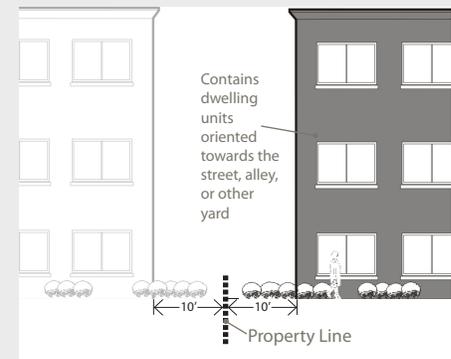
Ten foot side or rear yard setbacks are acceptable if units along applicable yard have solar access to street or other yard.
